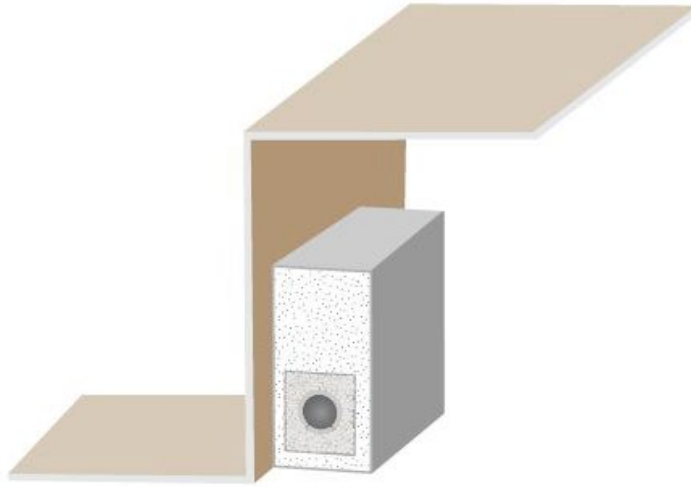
K-17 Wall Drain Installation (NRCS-TX)
